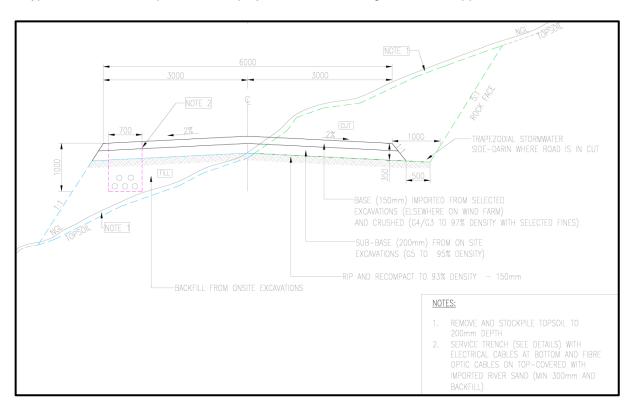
Typical road cross section for internal roads (see larger drawing n Appendix G)
